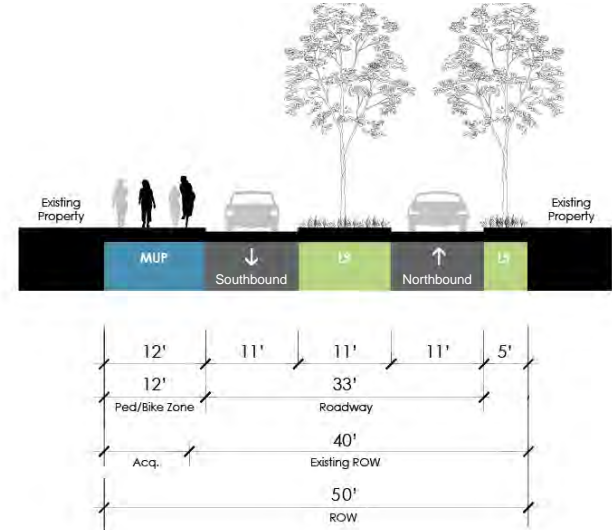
Typical Section Segment 2 (20th St NE to 22nd St. NE)
